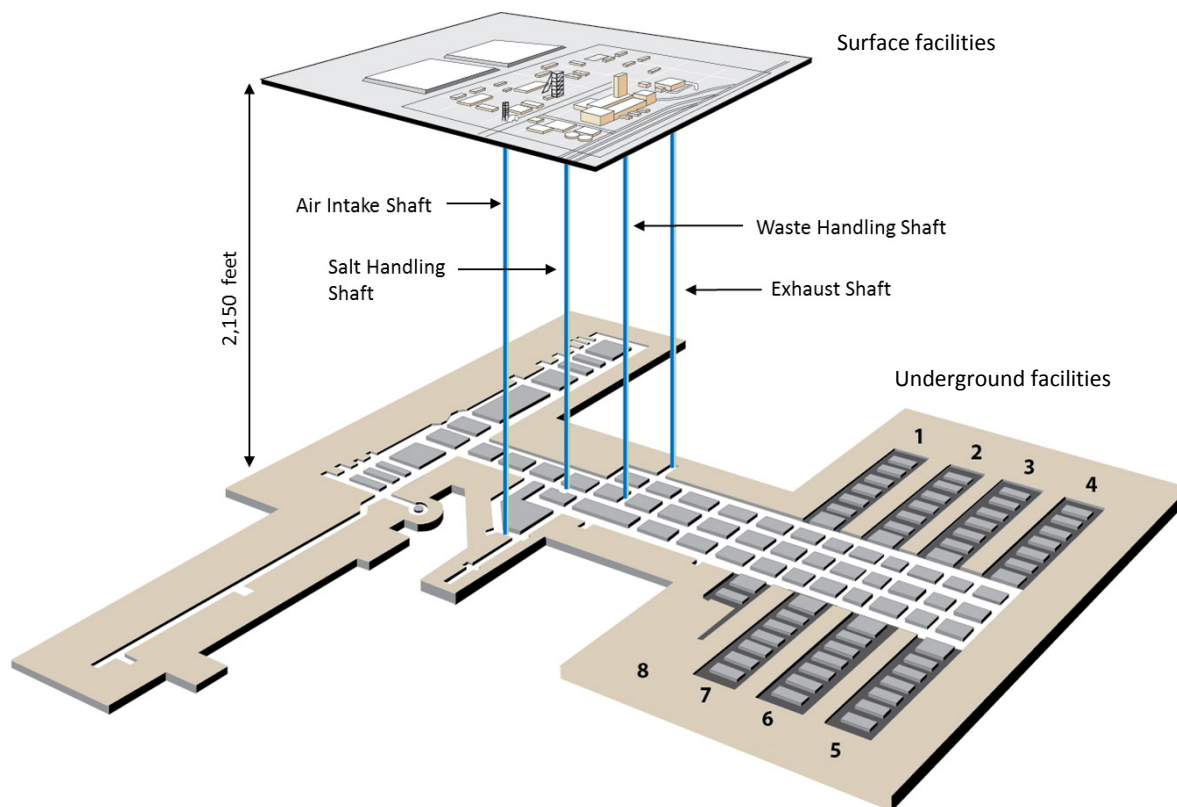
WIPP Surface, Shafts, and Underground Facilities
